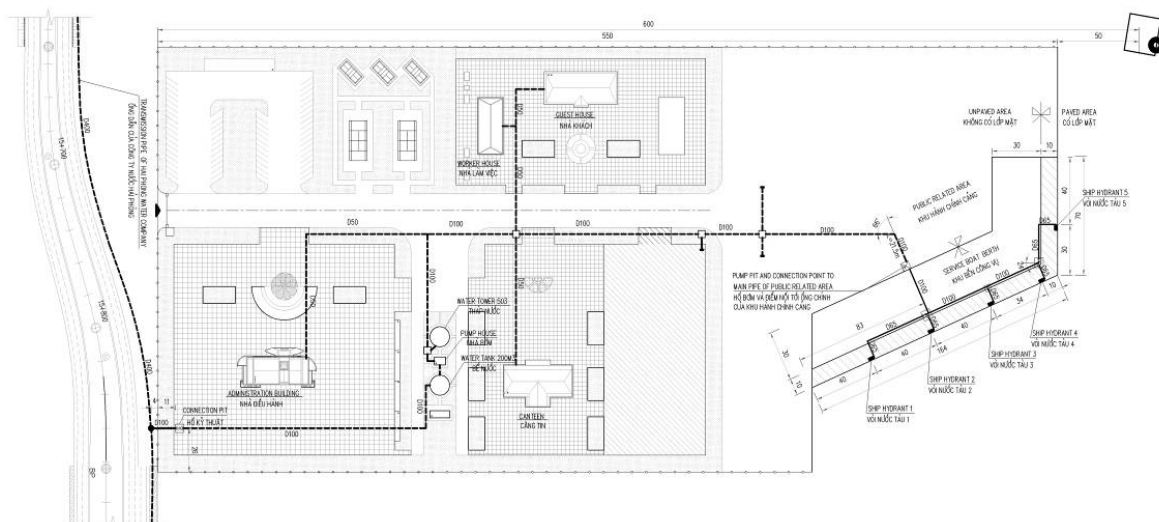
Proposed Water Supply System to Service Boat Berth
